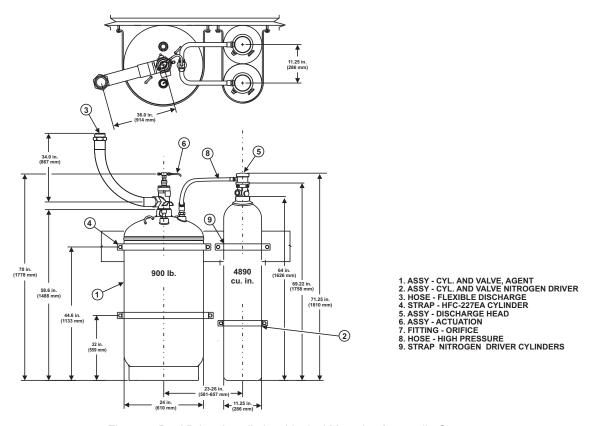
Dual Driver Installation, Vertical Mounting for 900 lb. Systems
